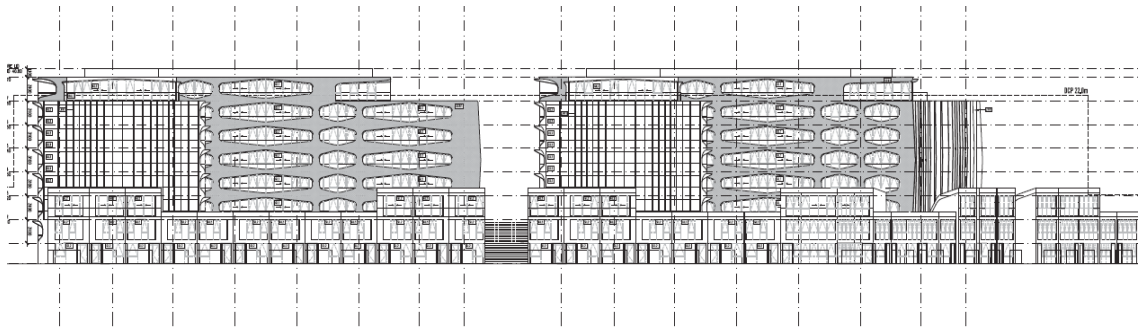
Approved Northern Elevation (top level deleted under Condition 2)
